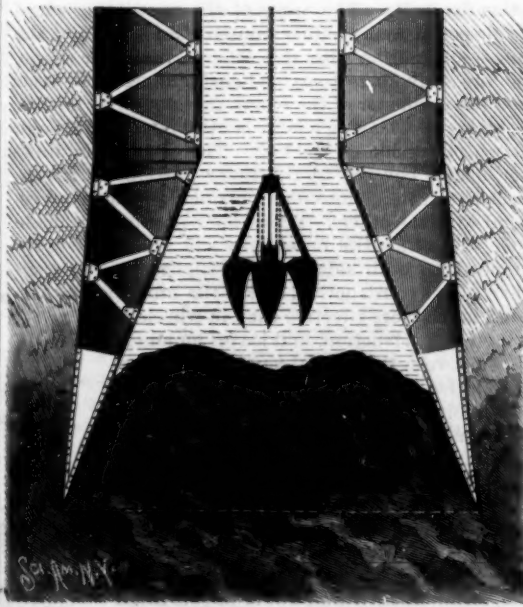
ENLARGED VIEW OF BOTTOM OF PIER.
